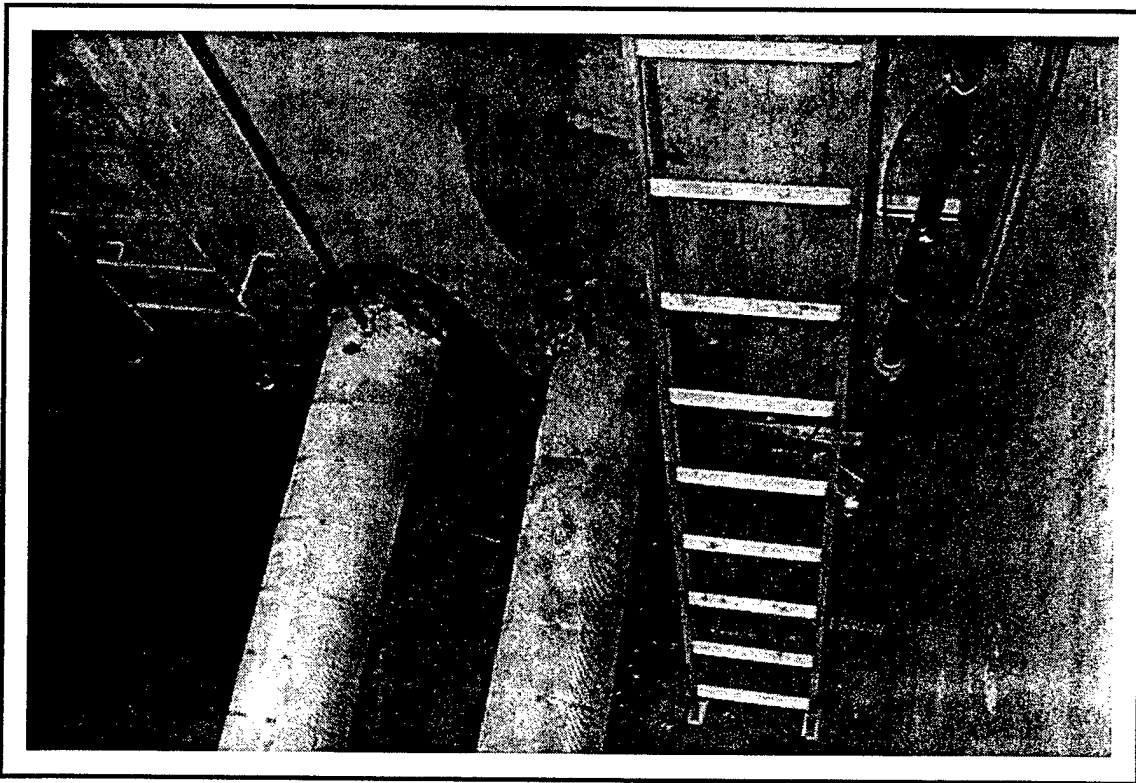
Casing corrosion of conduit at manhole wall penetration in Fort Stewart valve pit outside Building 410.
